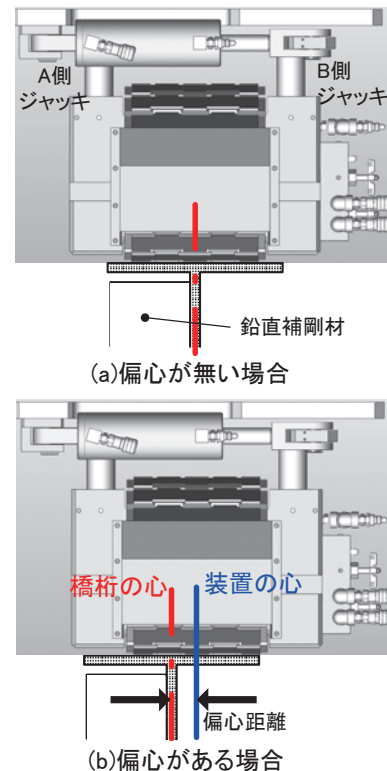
Eccentric of Bridge Girder and Synchronized Jack. 橋桁と履带式駆動装置の偏心
